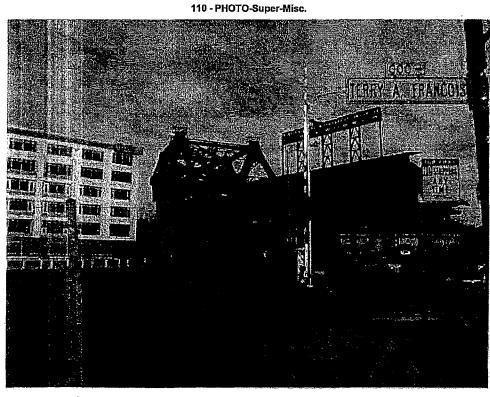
Photo 1 (Batch 27675) General picture of the bridge
